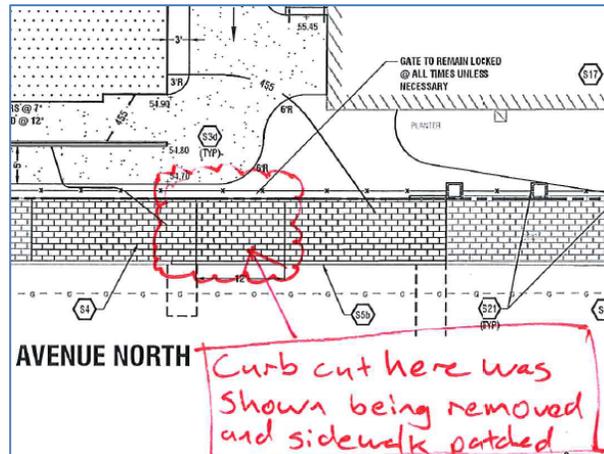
The approved plan shows that the sidewalk and the fence would be continuous across the area that originally had a curb cut.
